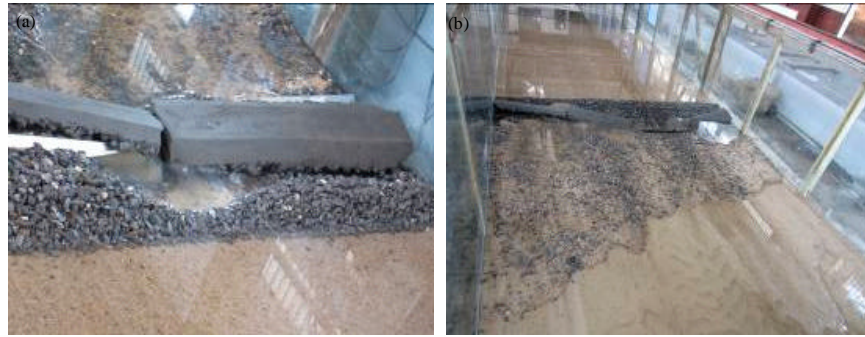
Photos of the ballast dam body with concrete and grouted rag collapse (a) Water damage firstly occurred where permeability rate is larger (b) Whole dam body damaged
